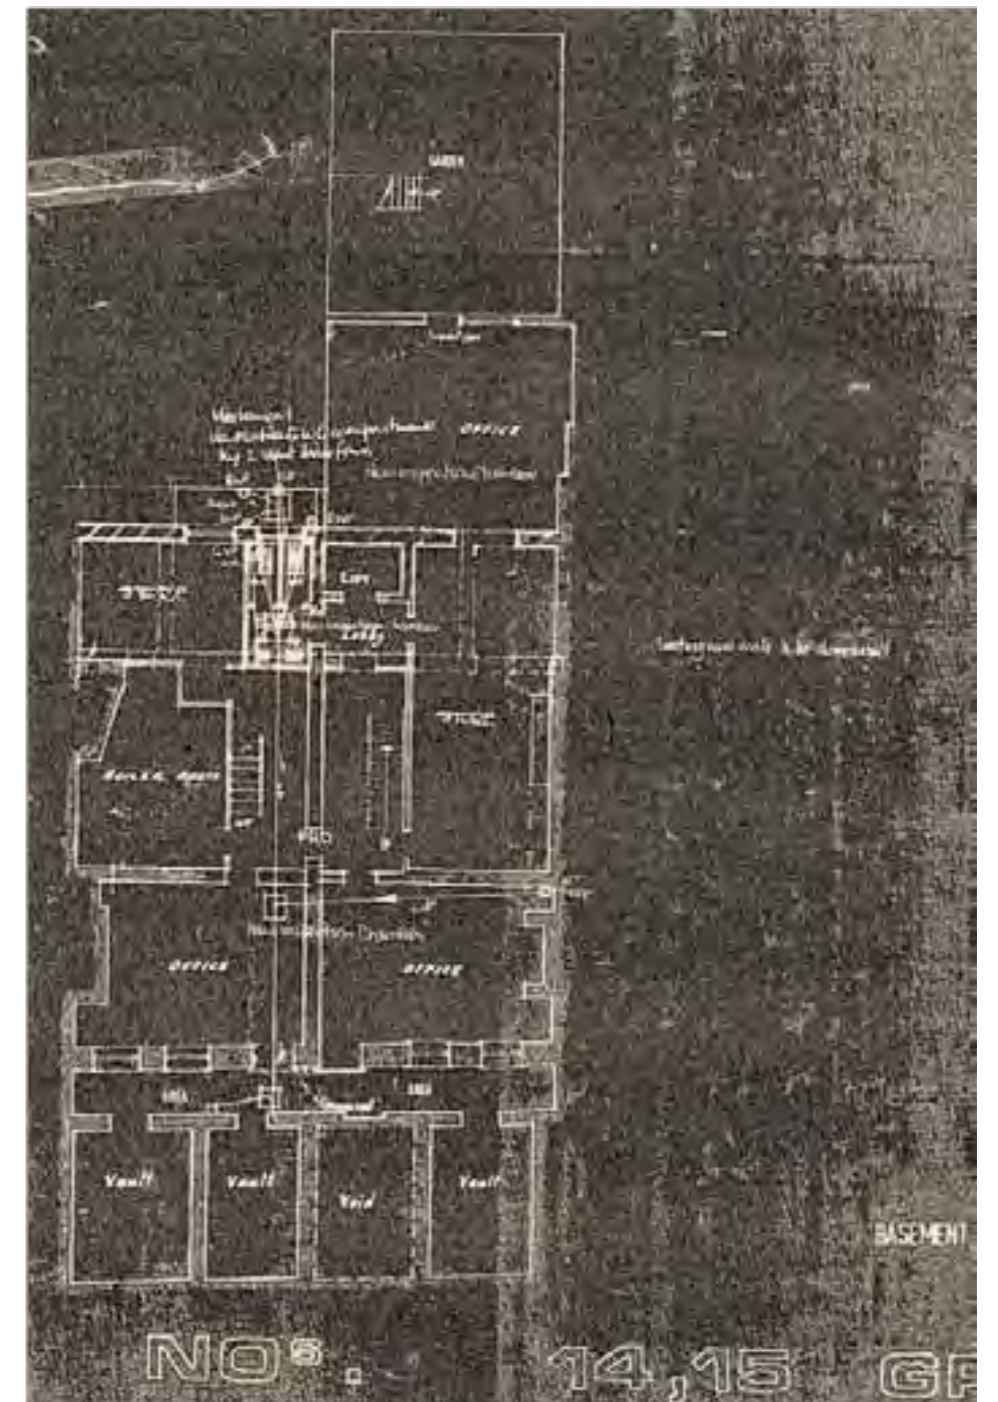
APRIL 1965 DRAWING FOR NOS. 14 AND 15 GREAT JAMES STREET, BASEMENT (SOURCE: CAMDEN LOCAL STUDIES LIBRARY AND ARCHIVE).
